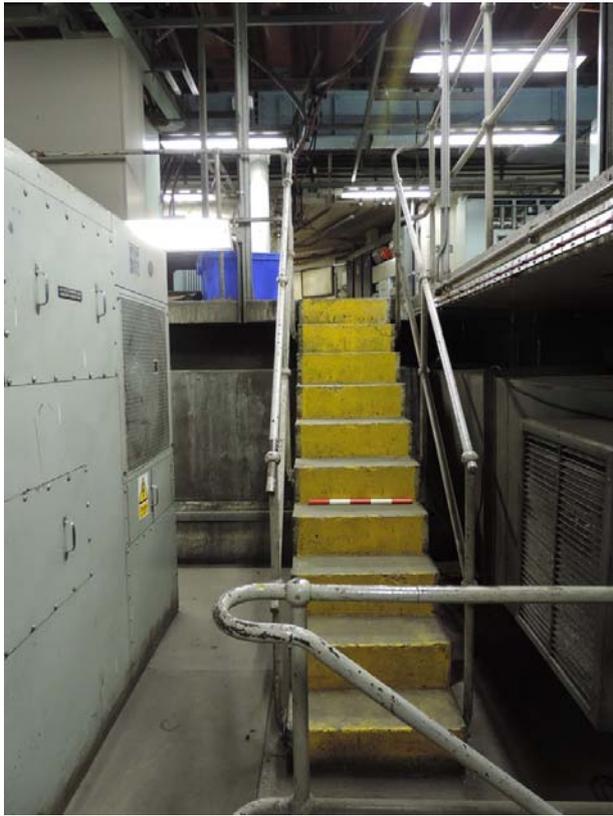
North-east low level area accessed by a single flight staircase, looking south
